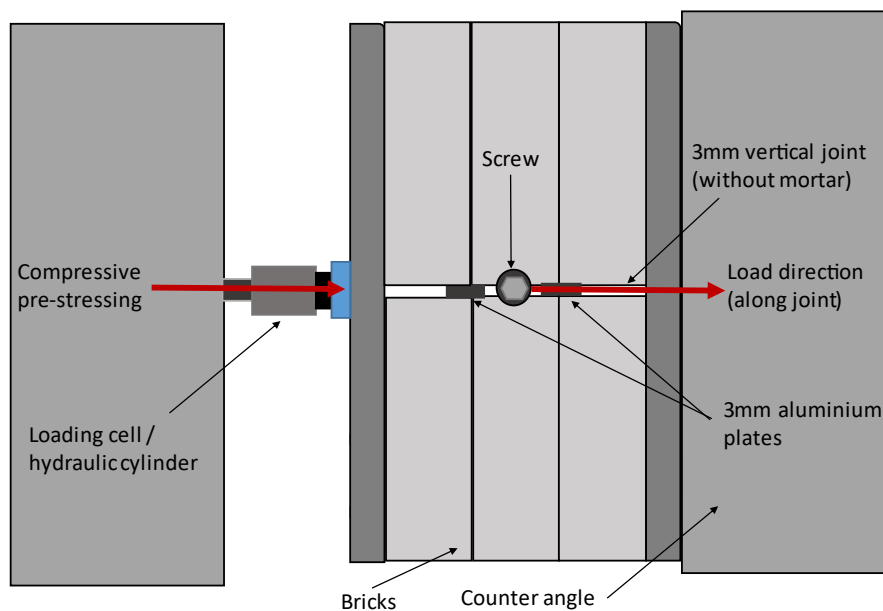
Schematic drawing of test setup for shear tests in vertical joints (test series A2j)
